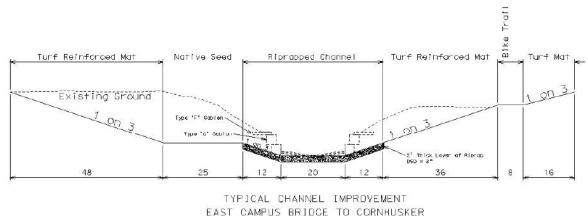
Typical cross section of proposed widening and improvement along Deadmans Run from Cornhusker Highway upstream to $48^{\rm th}$ Street.
